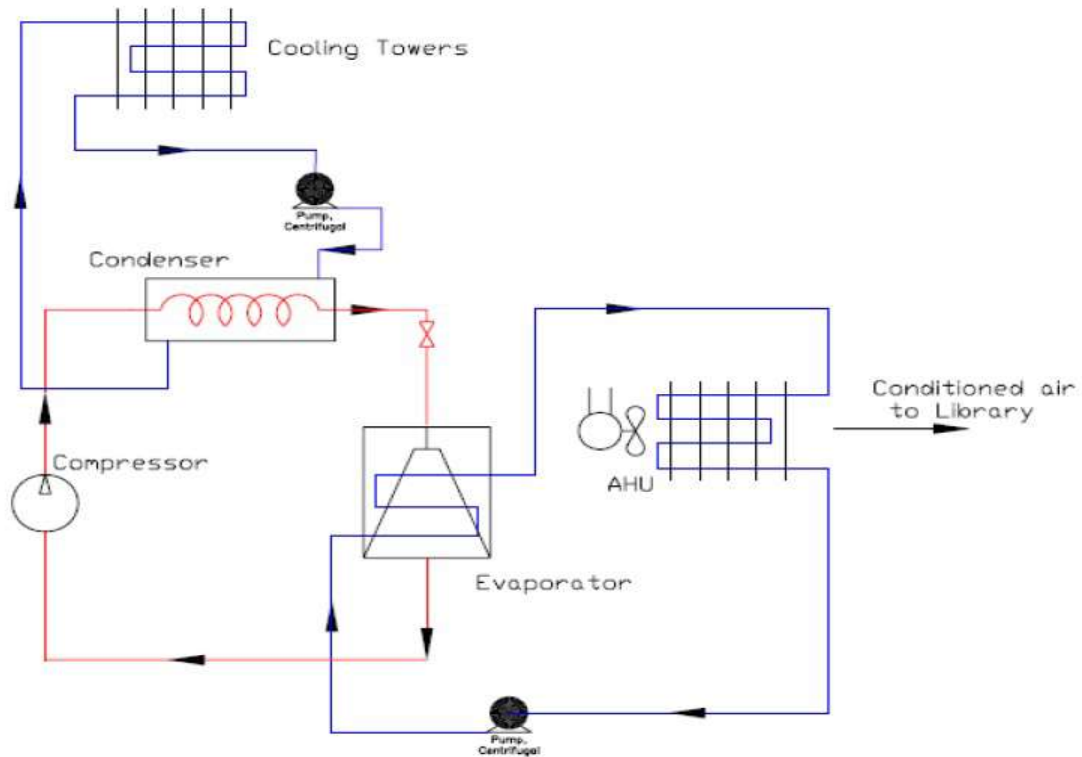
Layout of chiller plant installed at Saraswati complex
